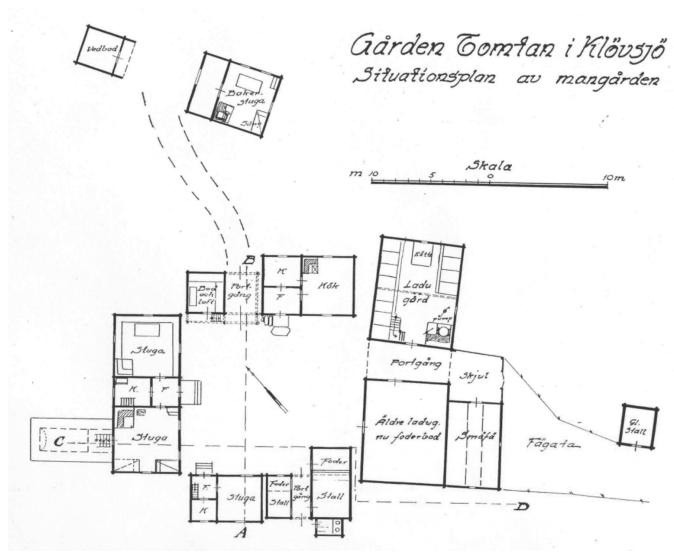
Site plan Tomtangården. (Jamtli, 2009).
